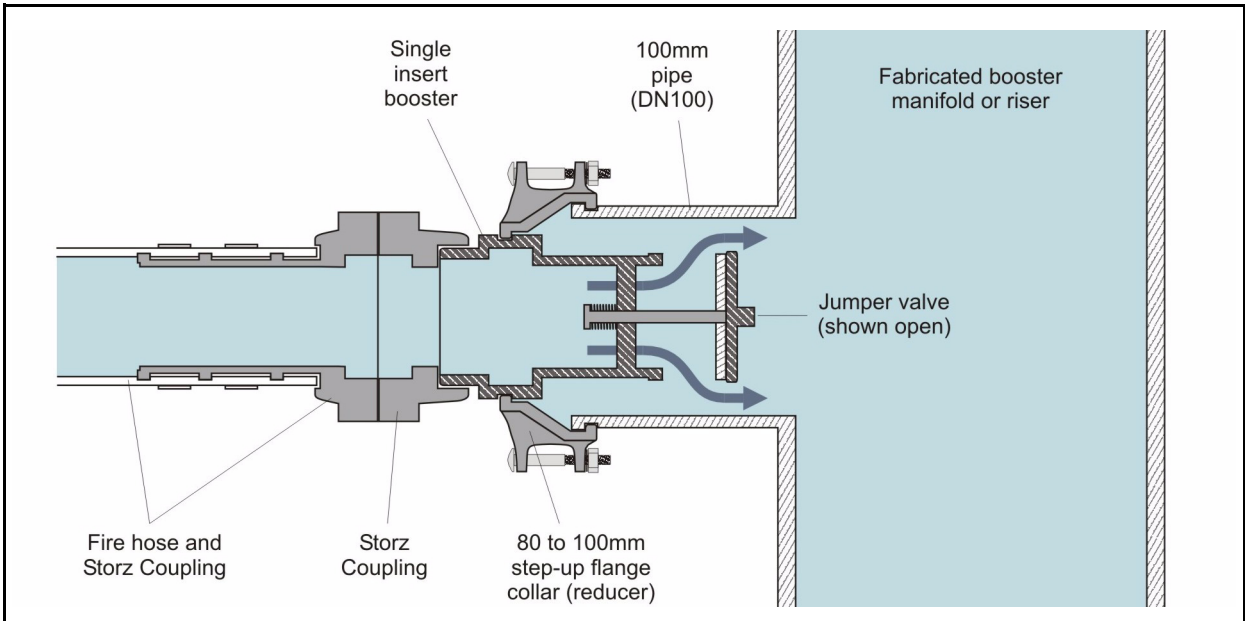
Cutaway of single insert booster fitted to DN100 piping using an 80 to 100mm step-up
